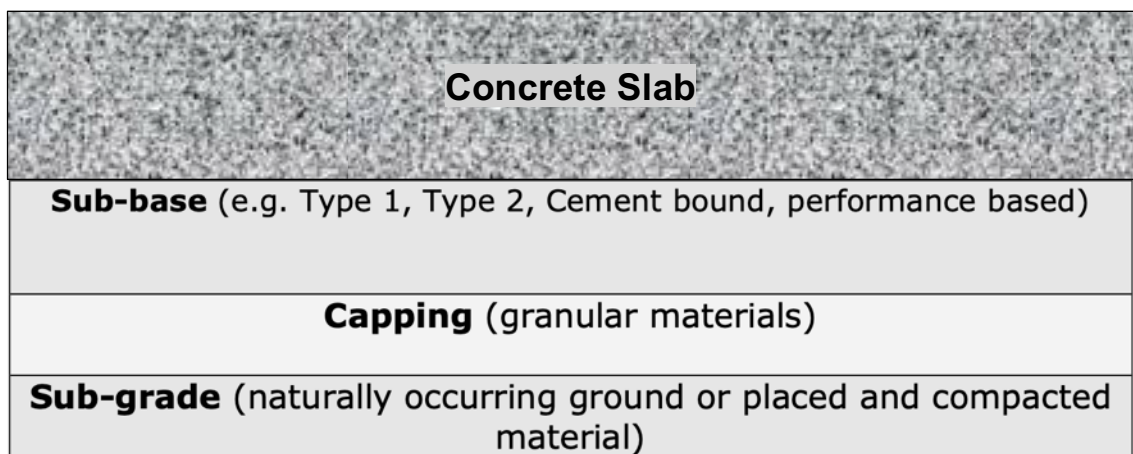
Cross-section of rigid pavement (Source: Ali, 2016)
